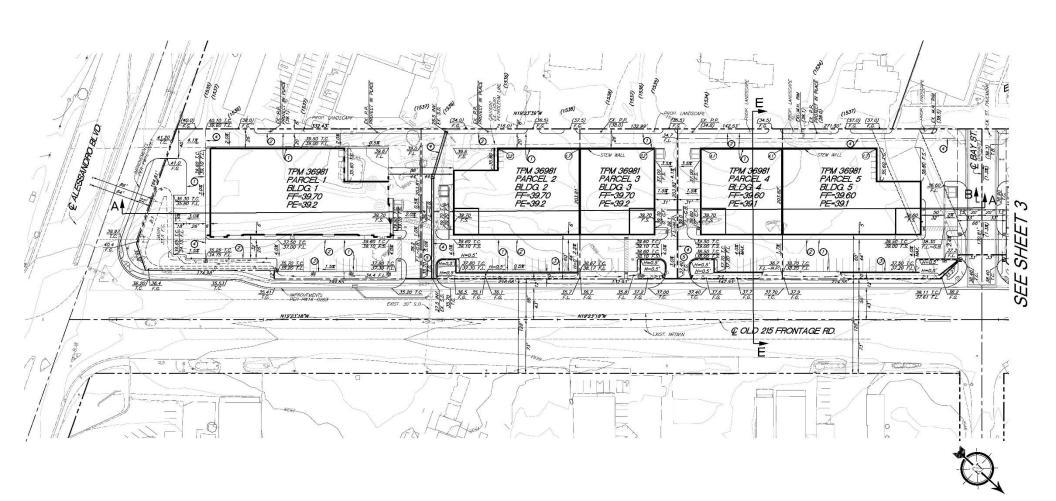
Project Plans (Preliminary Grading Plan)
